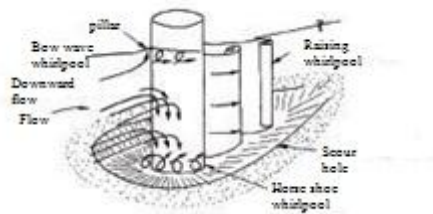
Downward flow and vortex systems around cylindrical pillar of bridge[13]
